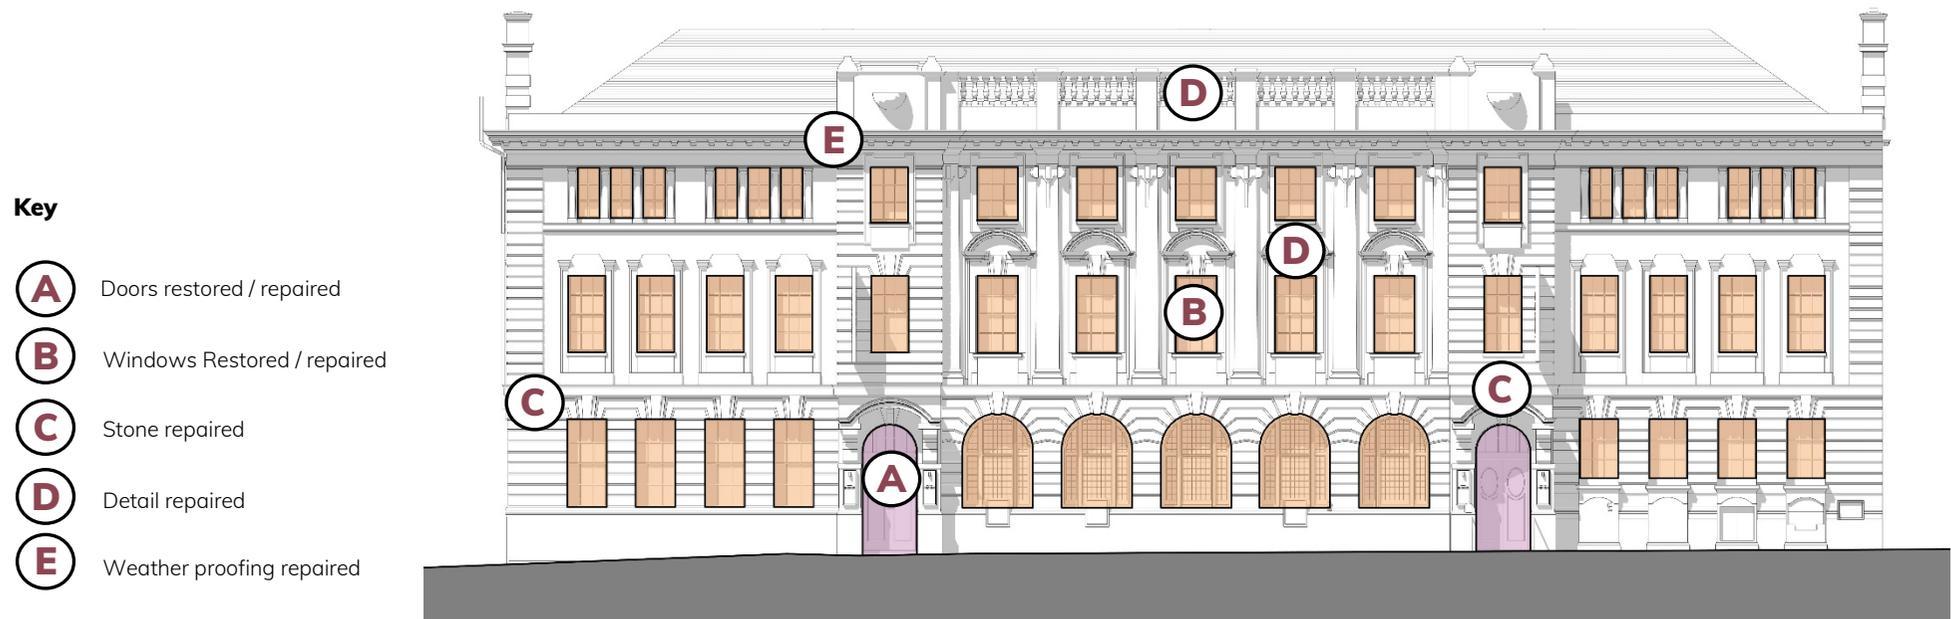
Proposed Restoration, Abingdon Street Façade, Post Office
